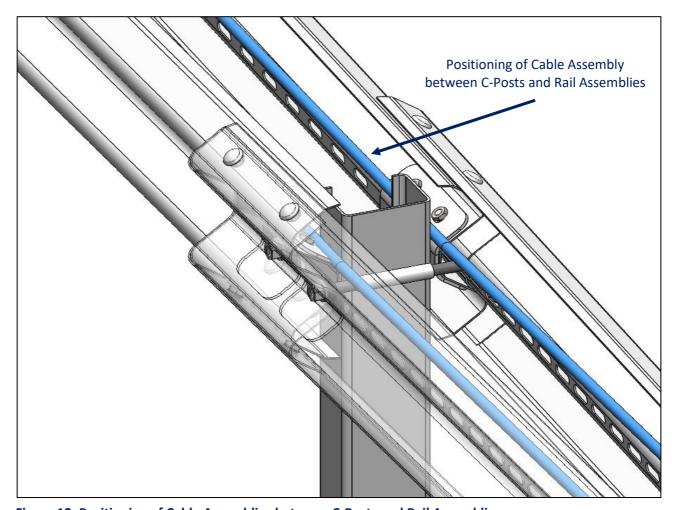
Positioning of Cable Assemblies between C-Posts and Rail Assemblies
